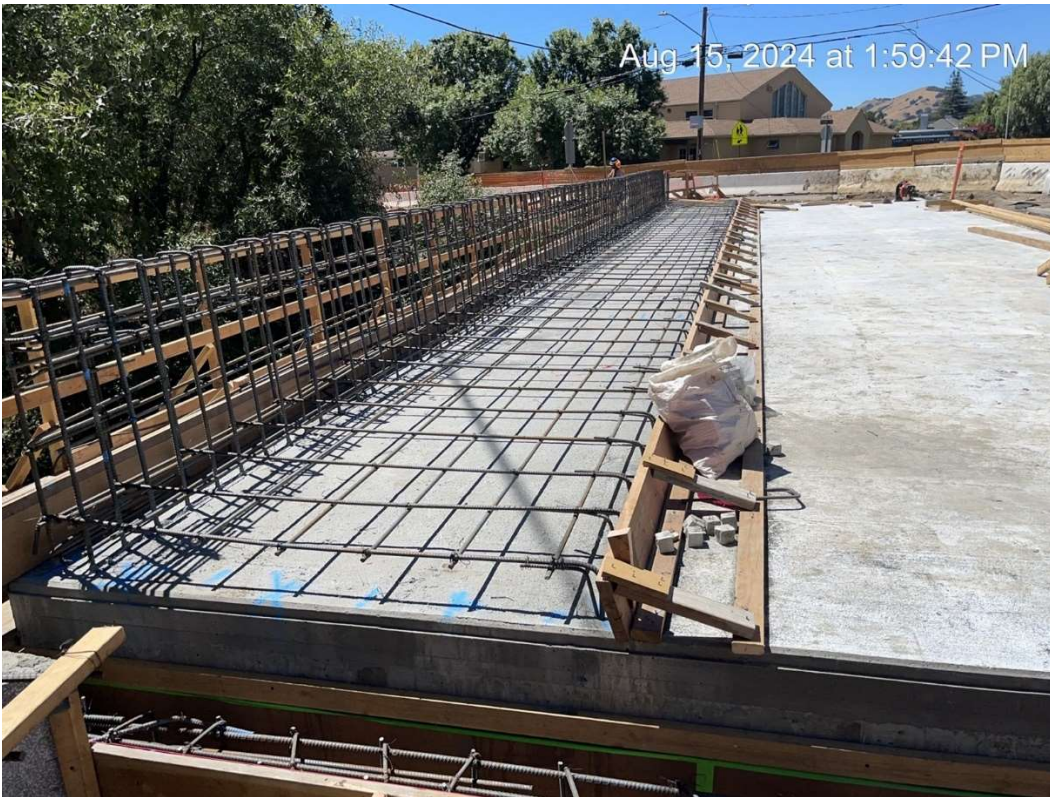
Sidewalk and Railing (Type 732 SW) Reinforcement complete.
